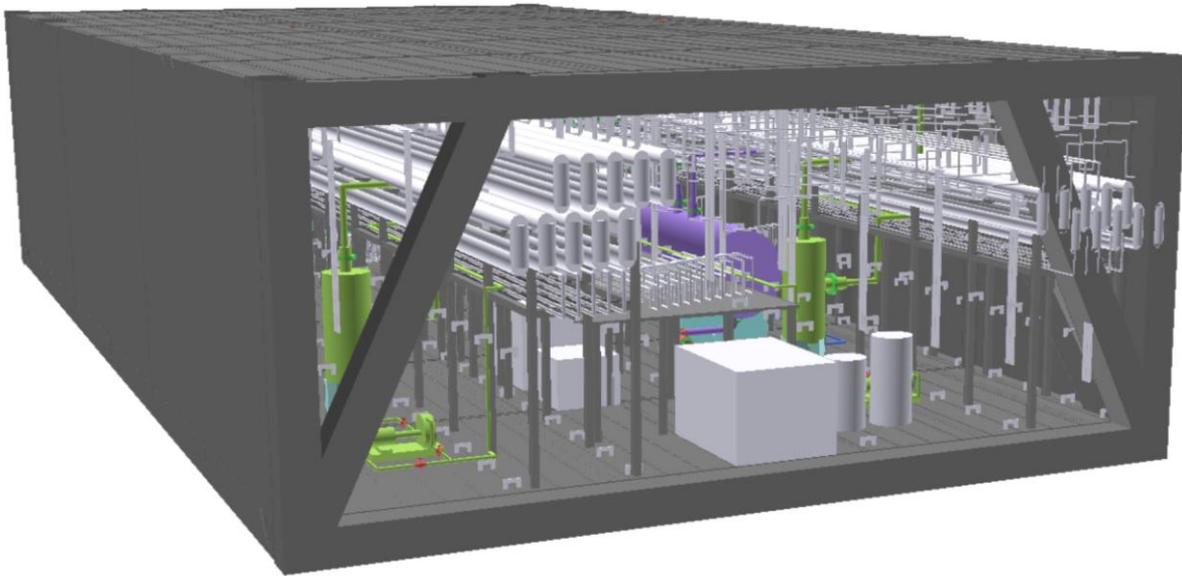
M132EW; about 13 000 gross m³, two open walls
